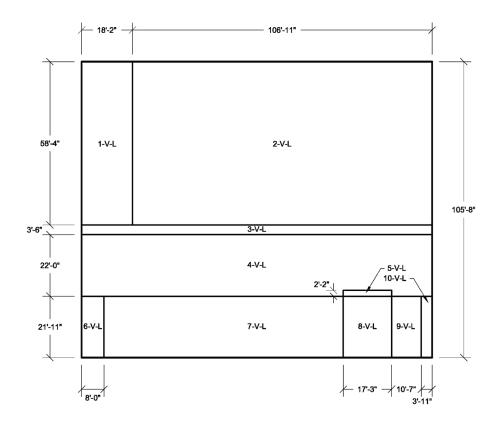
H.3-26 West Wall Looking East Vertical Reinforcement Zones Far Side Face
